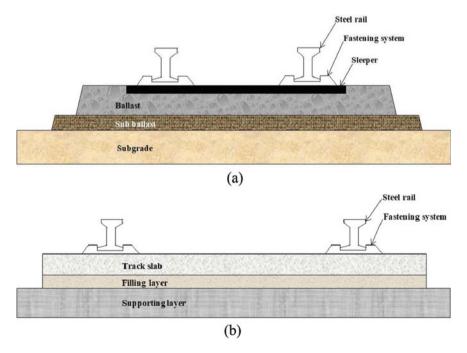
Schematic diagram of a Ballasted rail track; b slab rail track
